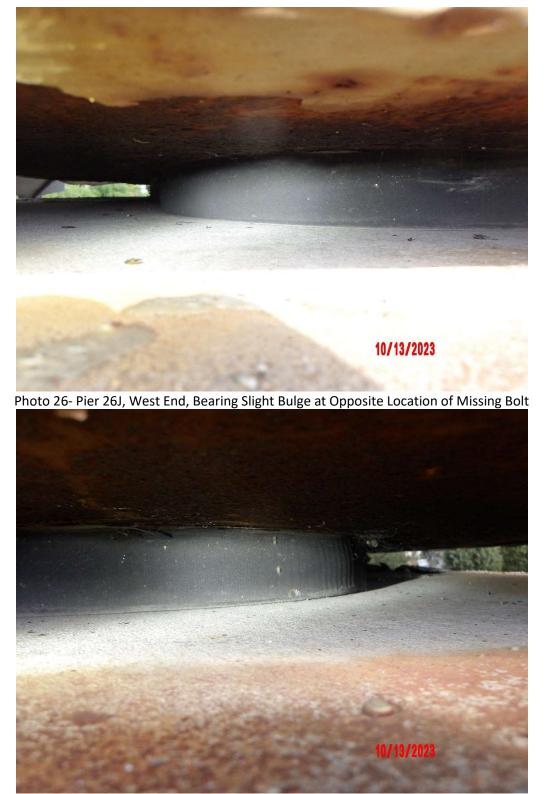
Pier 26J, West End, Bearing Slight Gap under Bearing at Location of Missing Bolt
